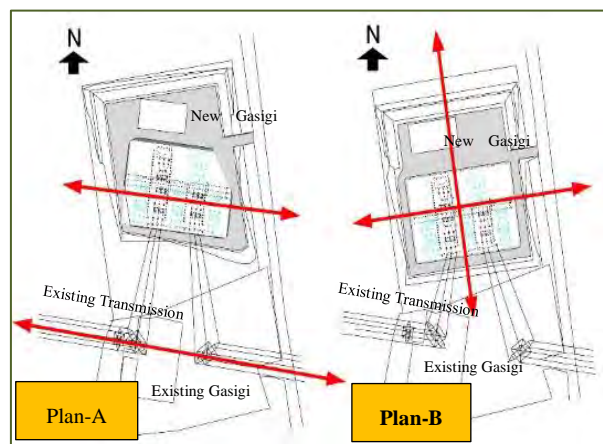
Arrangement plan of New Gasogi Substation
